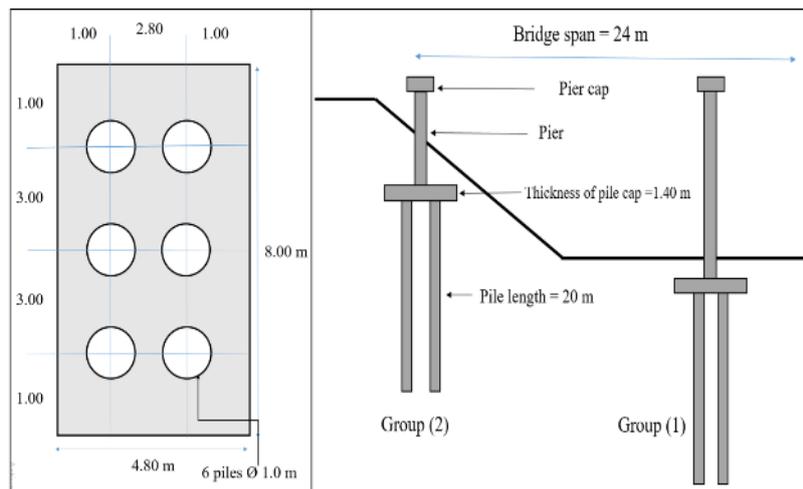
The geometrical model of bridge foundation and the section of piles distribution
